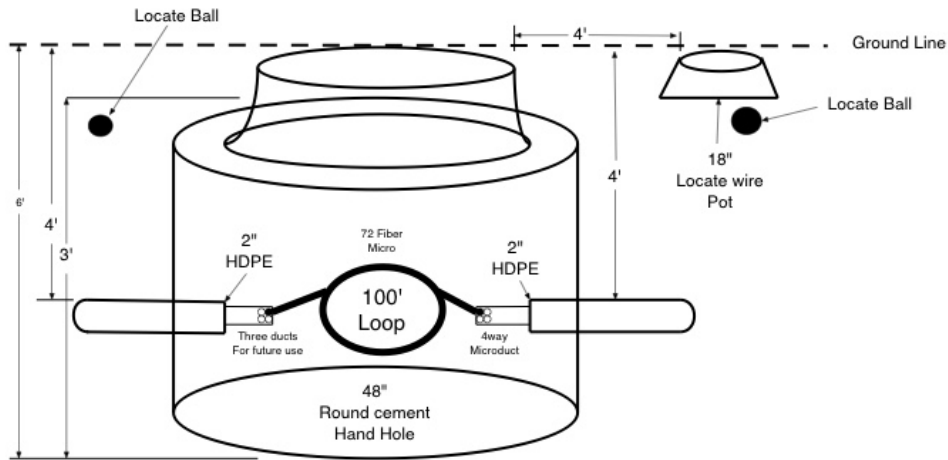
CROSS SECTION OF CONCRETE MAINTENANCE VAULT
